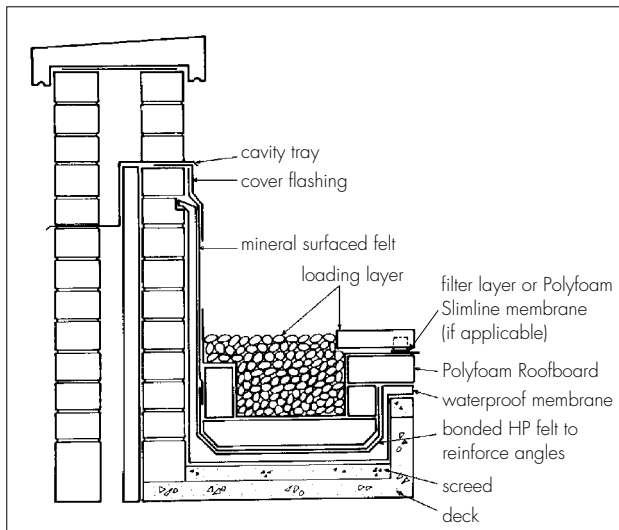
Parapet roof deck gutter detail (mastic asphalt)
